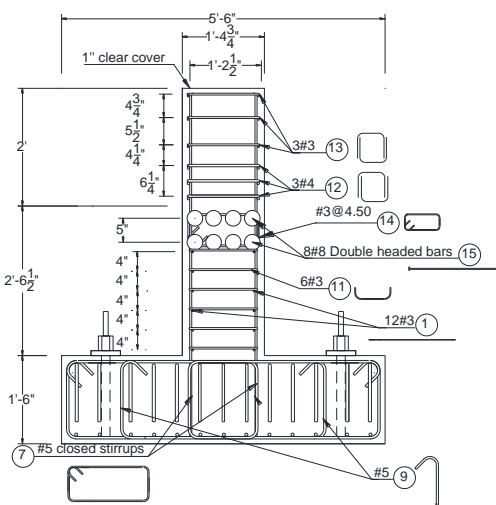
Side view in design drawings for Specimens 8 and 10
